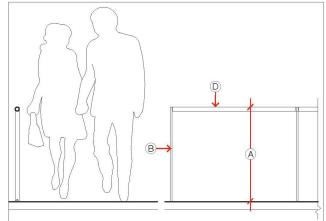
Pedestrian railing type 4 typical section and elevation
